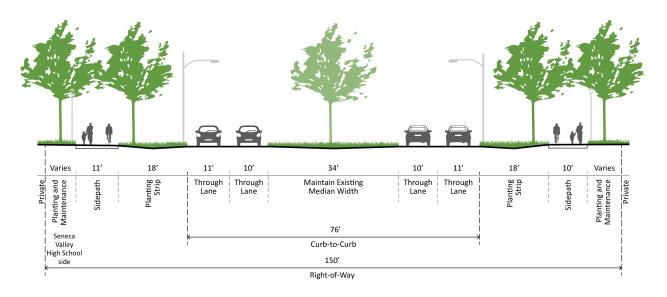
Proposed Typical Street Section for Great Seneca Highway (North of the Railroad Tracks)
